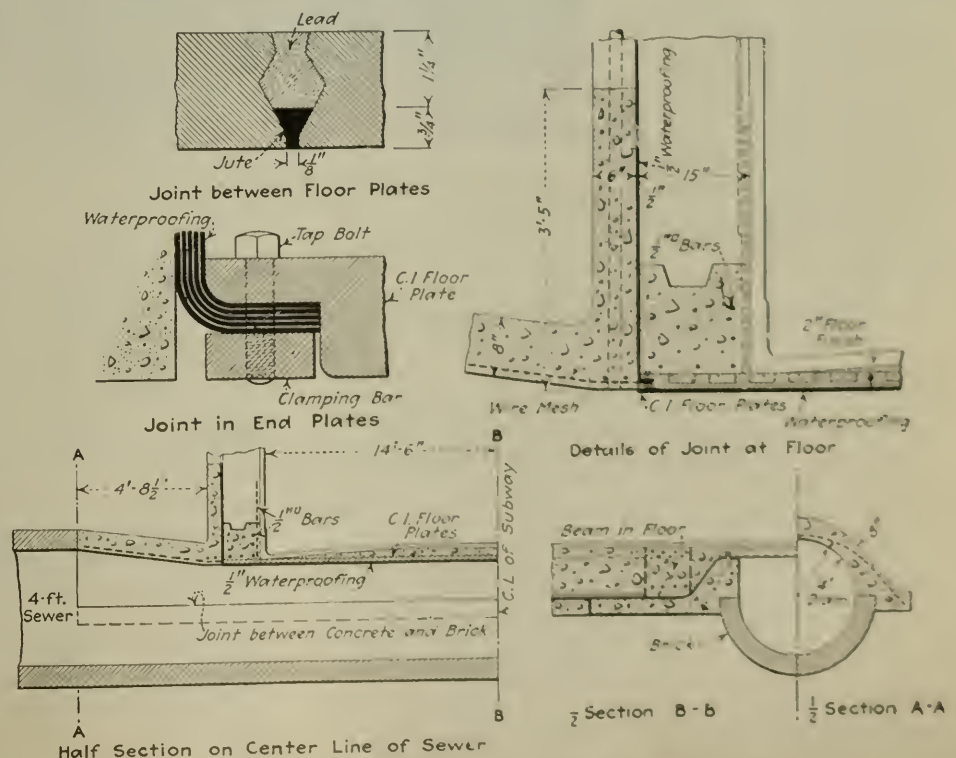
TOP OF SEWER BUILT INTO FOOTWAY FLOOR
